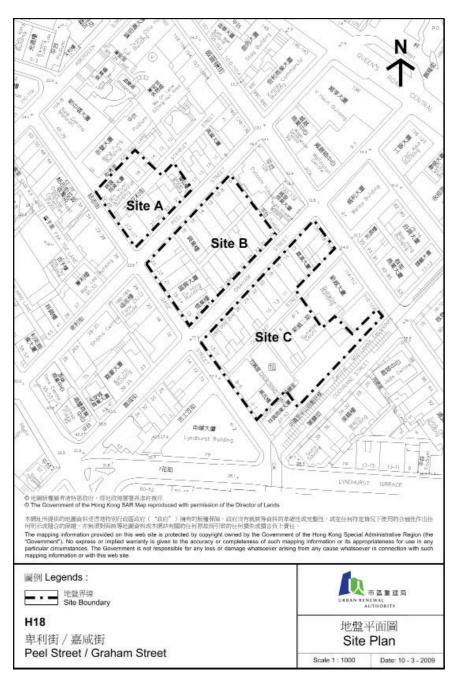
Urban Renewal Authority Peel Street / Graham Street development proposal site plan indicating three separate site for renewal. Currently Site B is completed while Site A and Site C are under construction.
